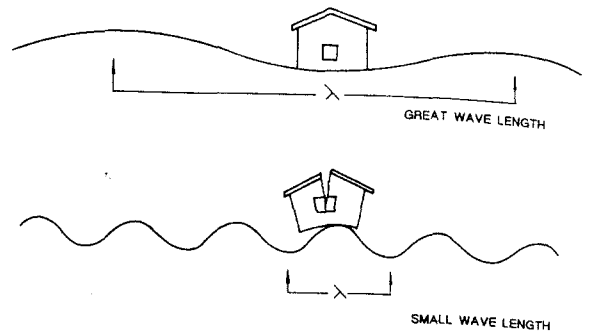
Interaction between the building foundations and vibrating ground.
